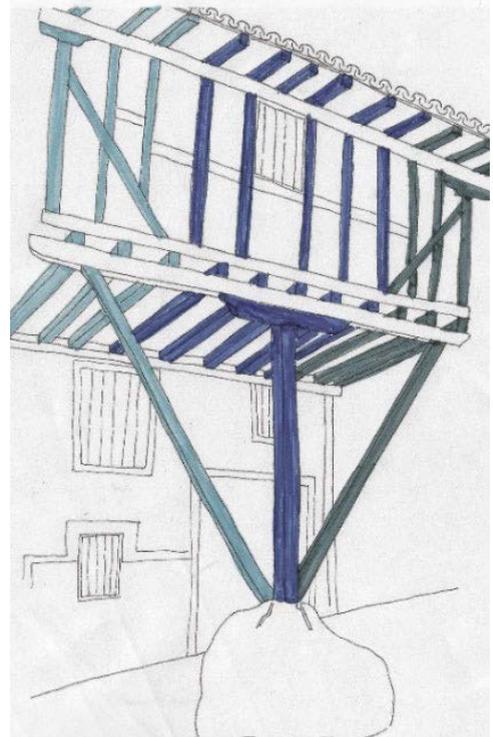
Facade. Garganta la Olla (Source: Franco, 2021)
